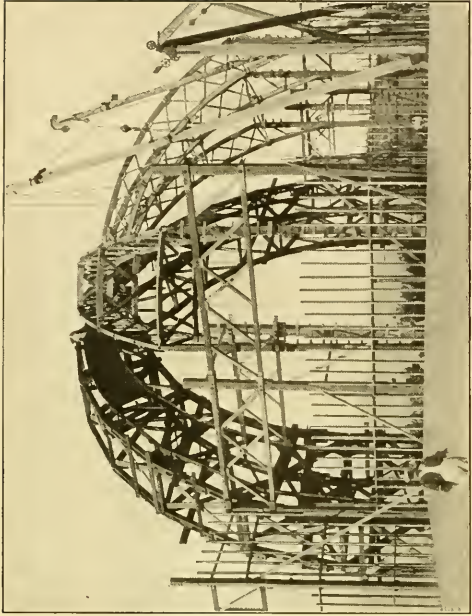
FRAMING OF HALF DOME, FOOD PRODUCTS BUILDING
